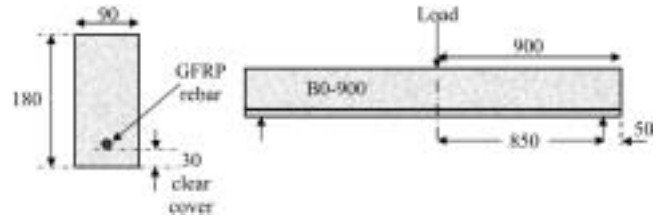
Cross section and nomenclature (B0-900). (Note: dimensions in mm.)
